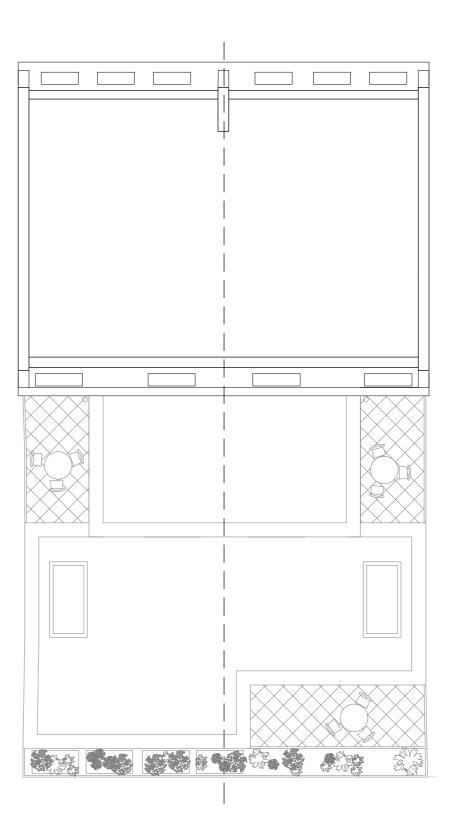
Approved second floor and roof plan ref. 23/1819/FUL
